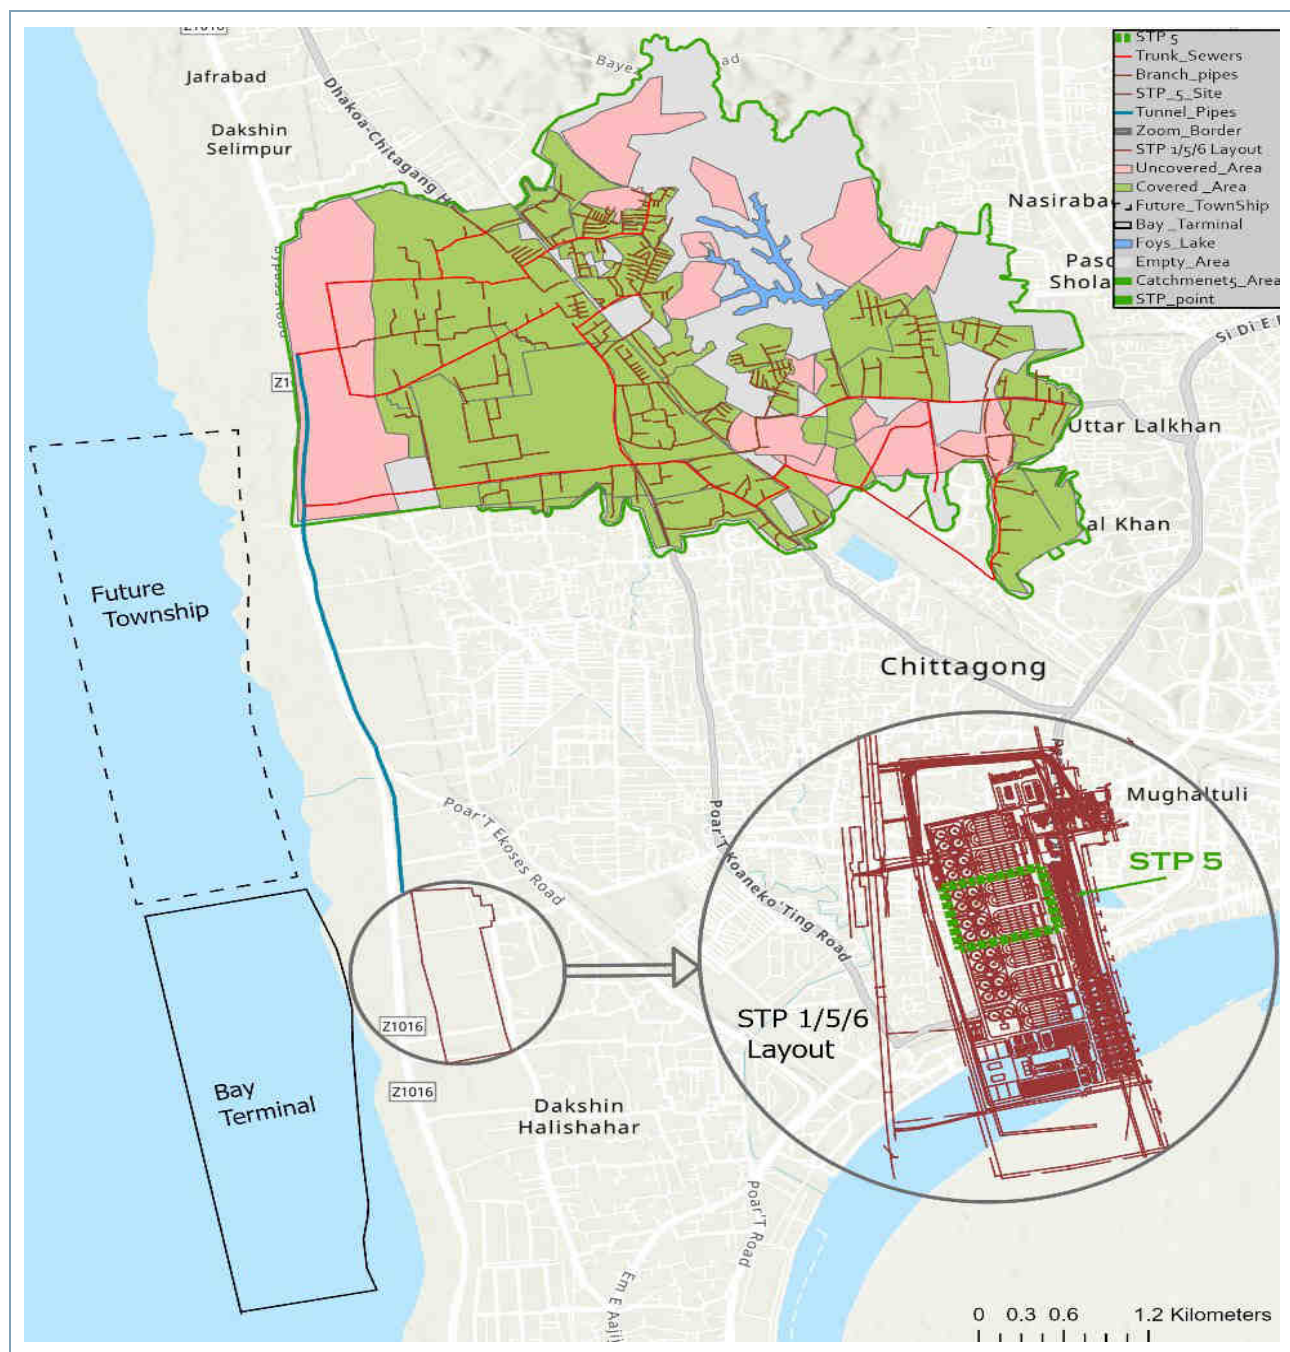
Layout Plan of Sewage Treatment area (Catchment 5)
